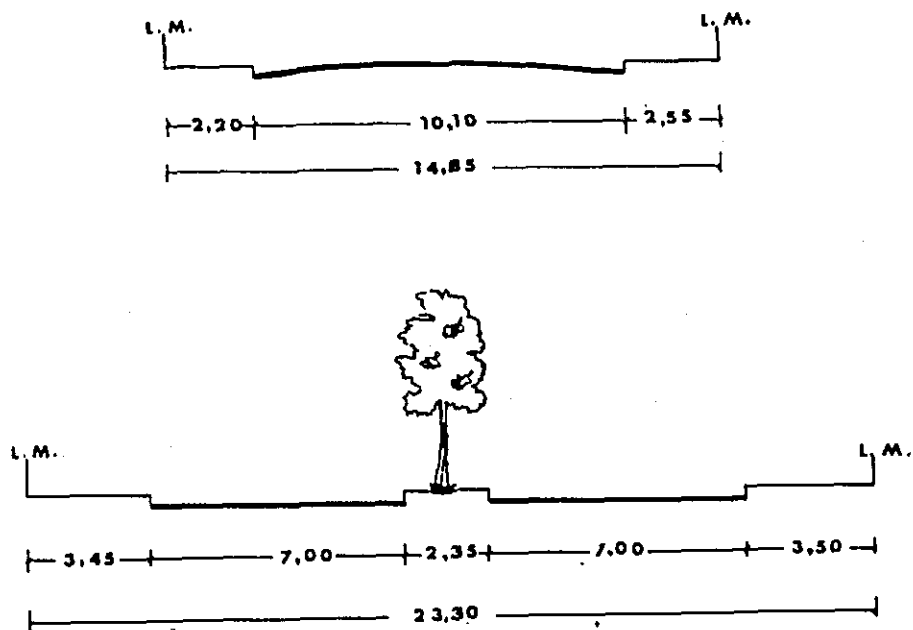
CROSS SECTIONS OF MAJOR ROADS (2)
